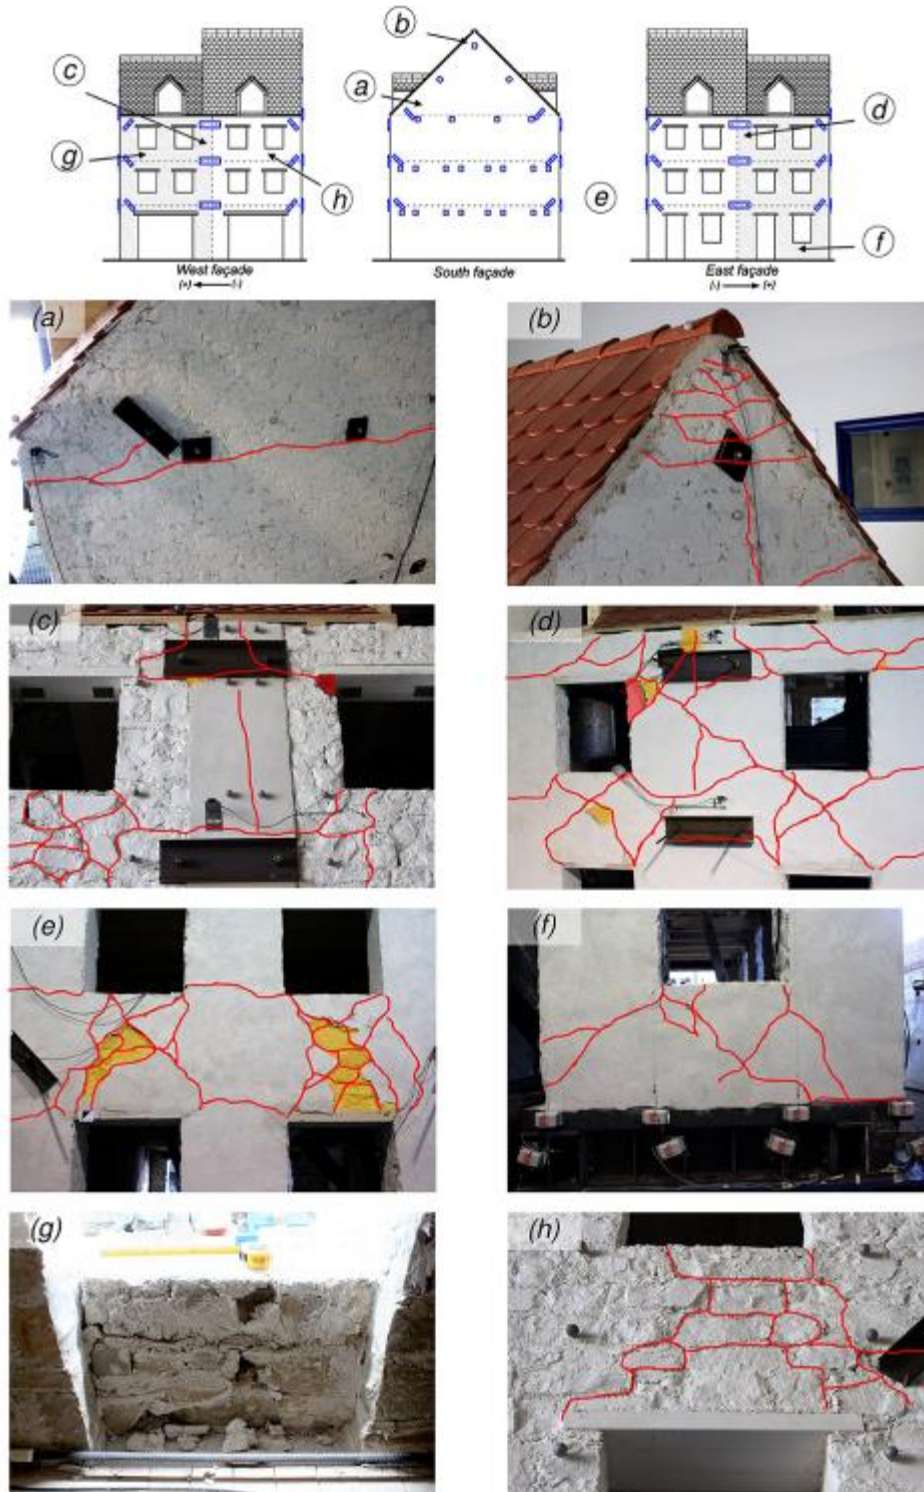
Observed damage pattern at the end of test MON-275%: (a), (b) out-of-plane overturning cracks on the South gable wall; (c), (d) crack pattern on the central pier of the West and East walls, respectively, with vertical cracks in correspondence of the structural joint; (e) damage in the East wall spandrels at the first-floor level; (f) flexural cracks at the base of the northern piers of the East façade; (g), (h) de-cohesion of stones in the West façade spandrels. Cracks marked in red opened or widened during the test; red-shaded areas represent detachment of stones, yellow-shaded areas detachment of plaster.
